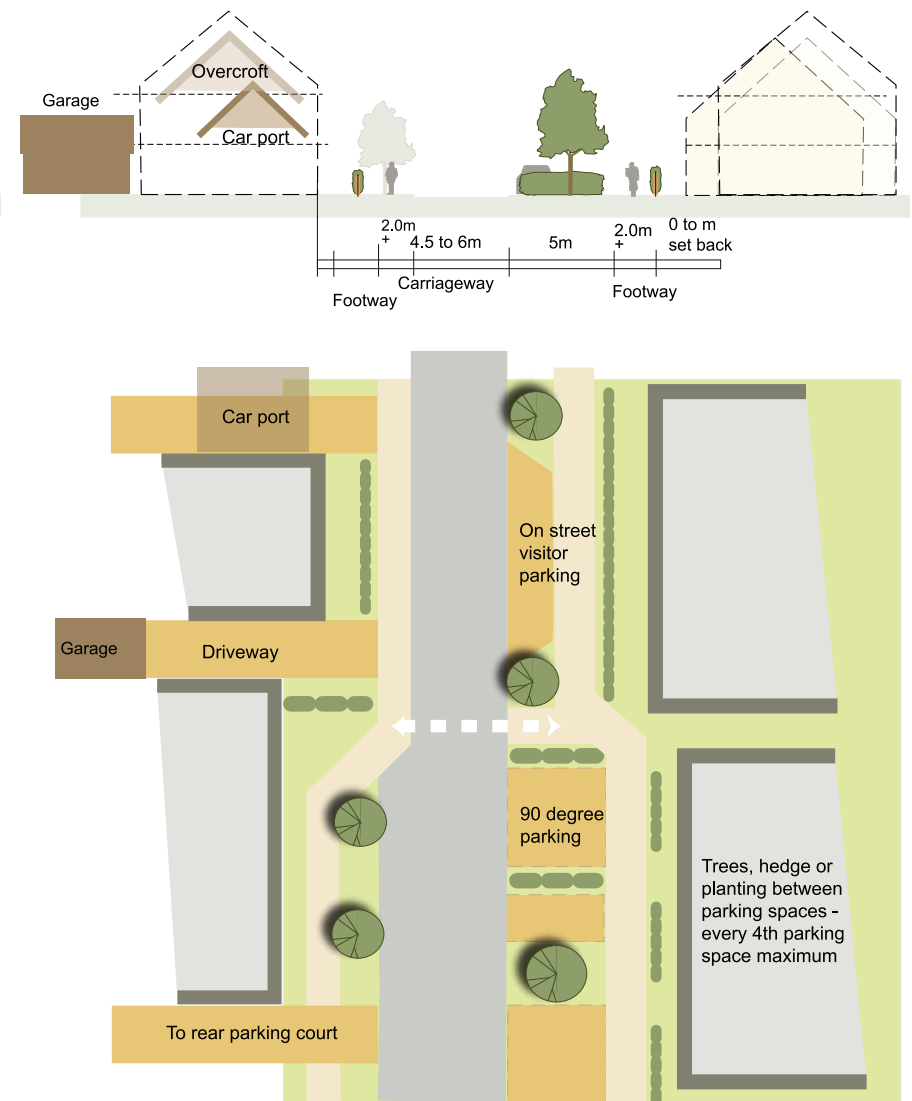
Local street (chicane style) with a mix of parking and building set backs.
